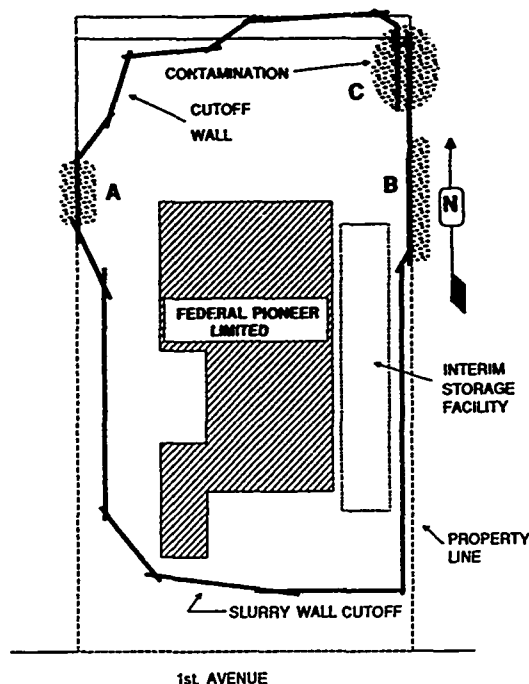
Location of Areas of Off Site Contamination and Route of Slurry Trench Cutoff Wall
